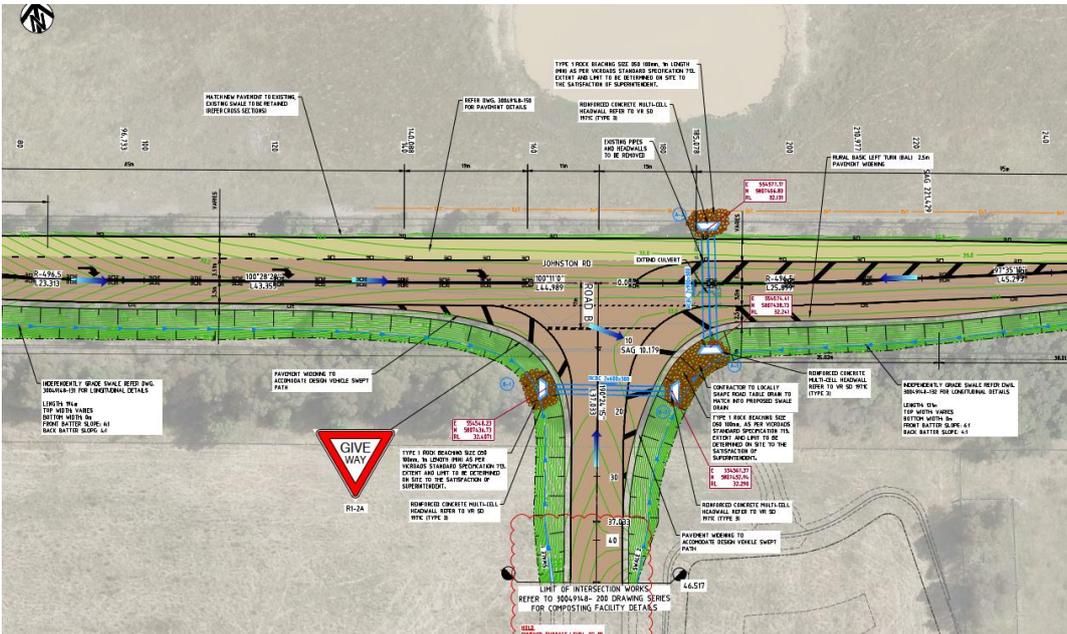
Proposed Johnstons Road and Site Access Road Intersection Design
